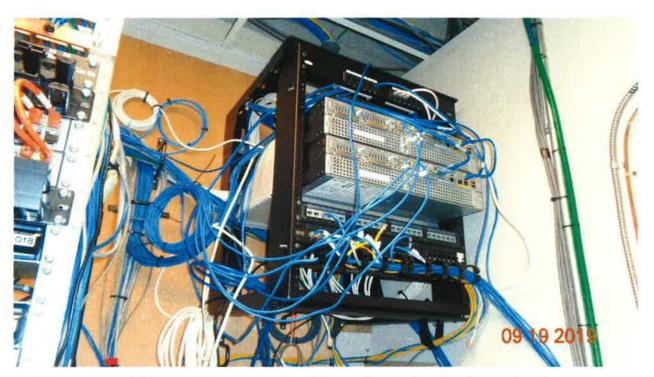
Wall Mounted Equipment Rack is not Bonded to the Grounding System
